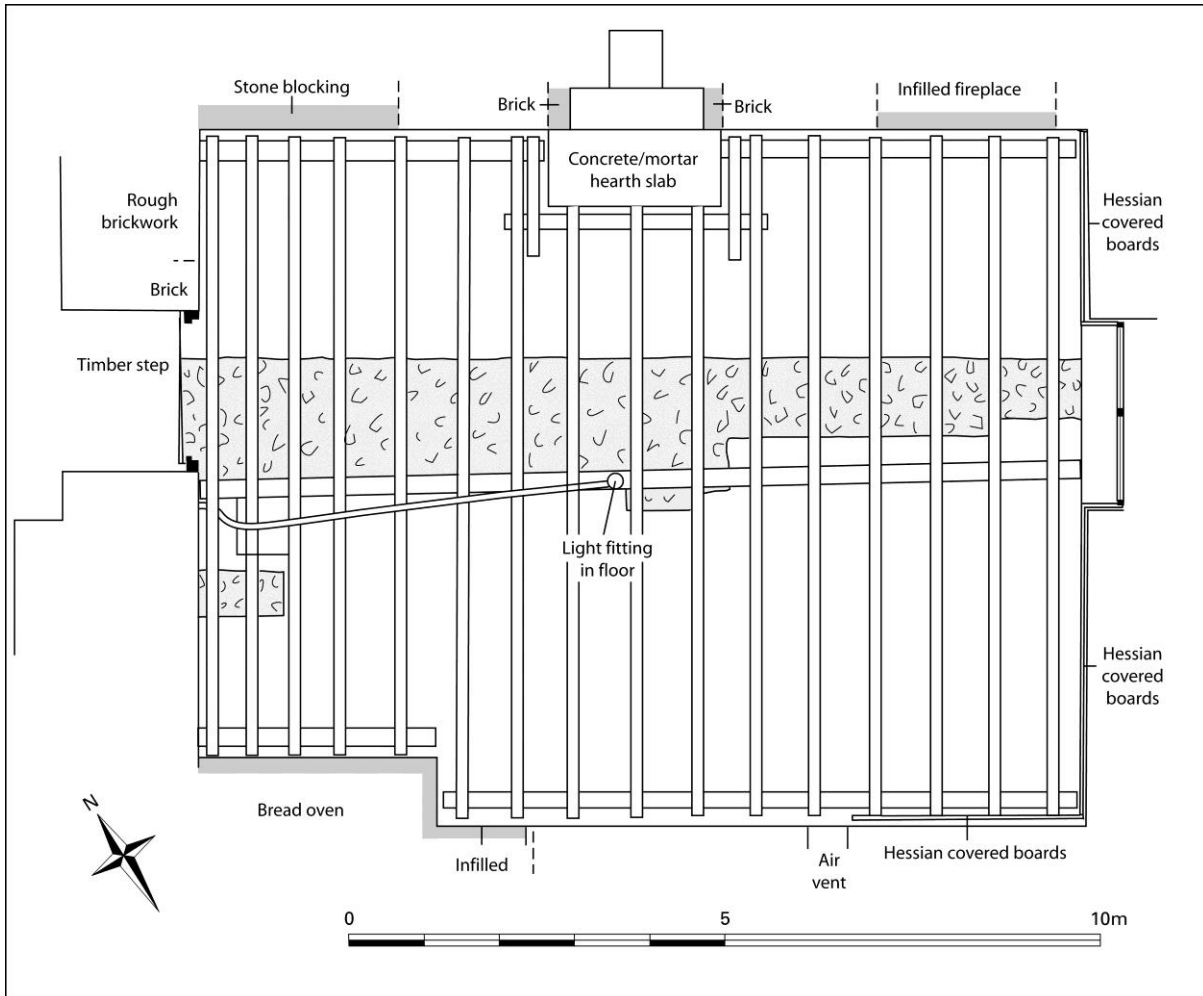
Plan of Room B7 showing sub-floorboard features (Andy Isham).
